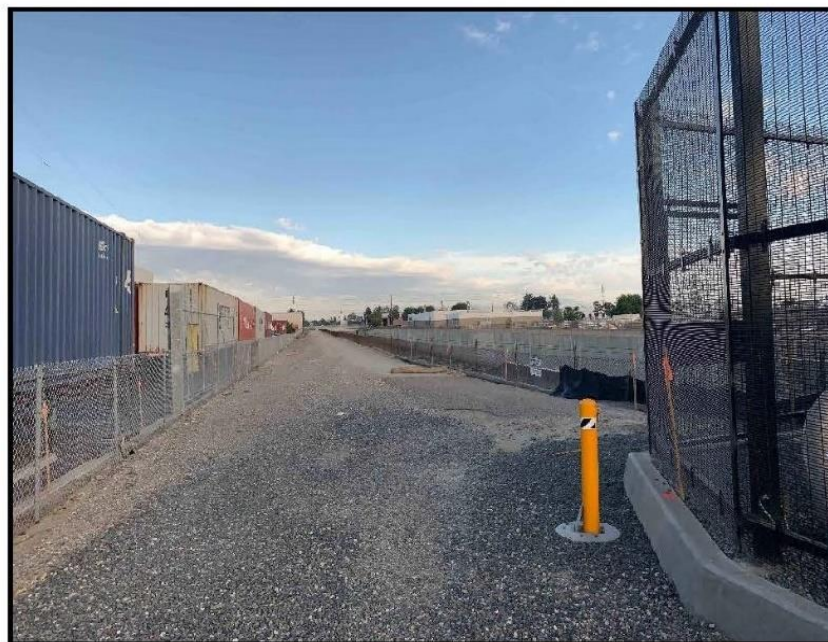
Representative photo of the concrete-lined channel land cover (Coyote Creek Channel) and dirt maintenance road. This section is located in Segment O.
